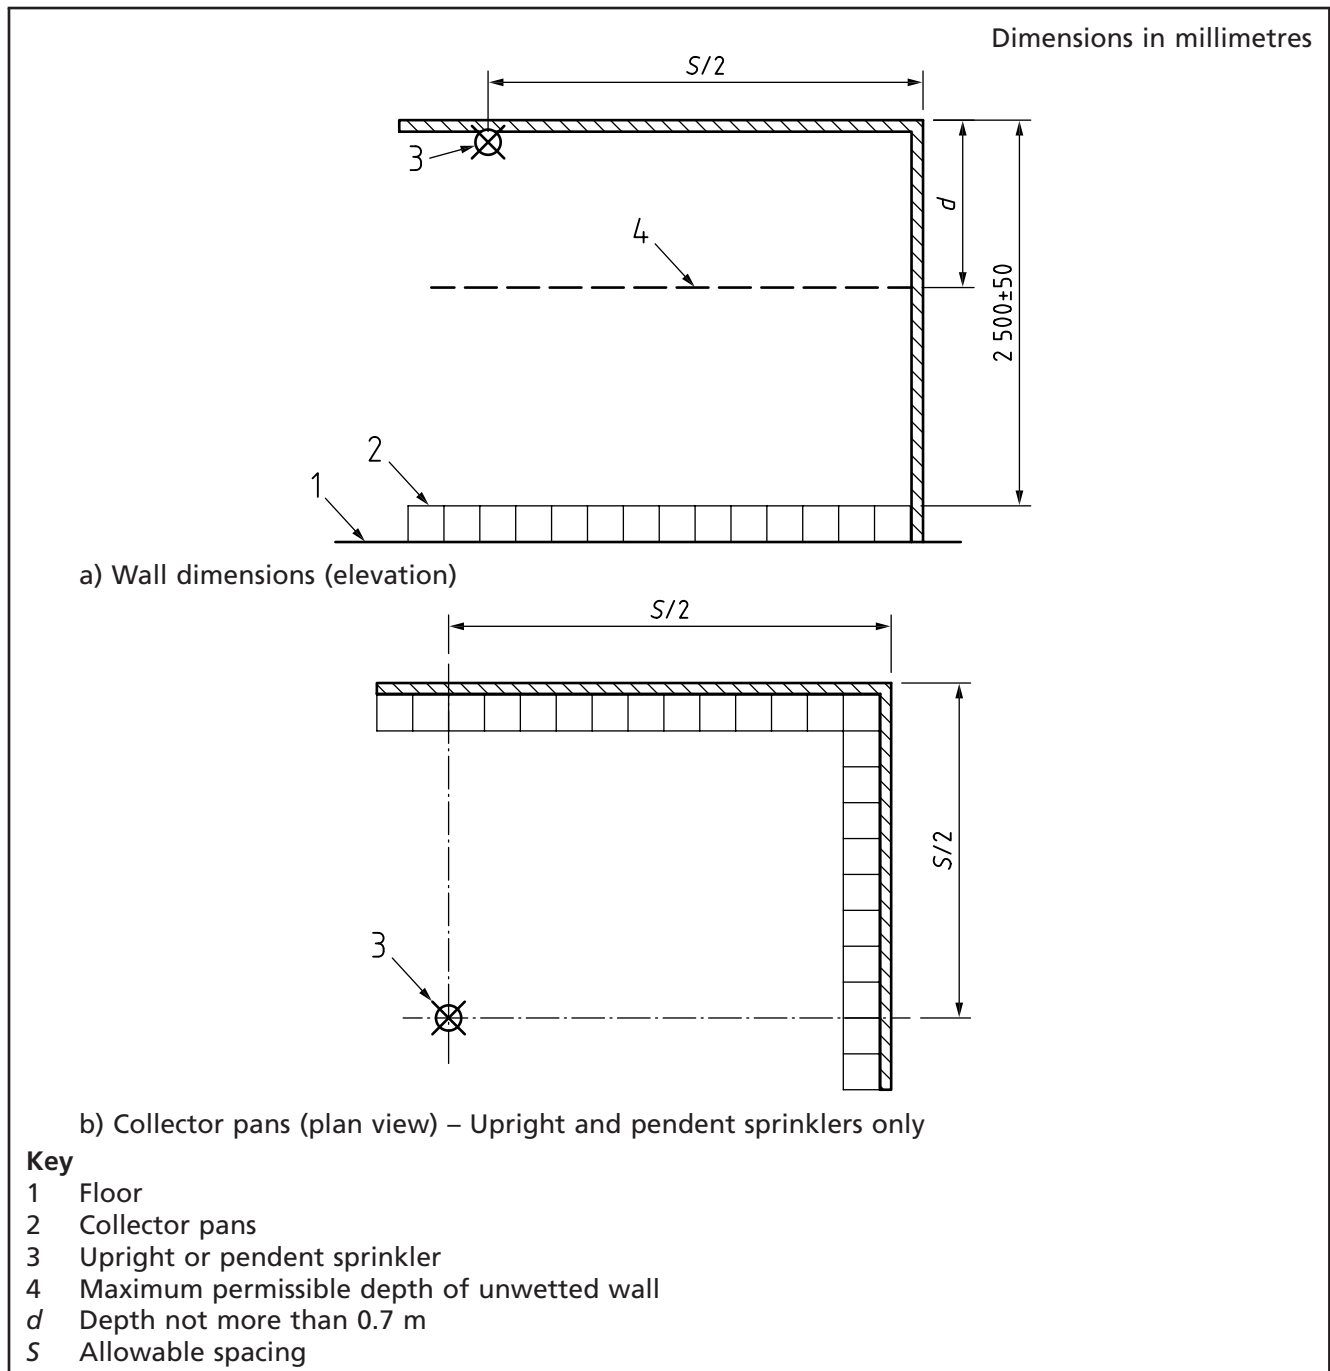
Vertical water collection and wall wetting (upright and pendent sprinklers)
